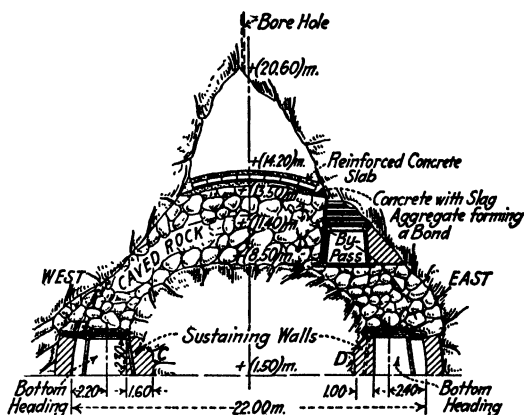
CROSS-SECTION OF RING 103, DURING CONSTRUCTION OF THE REINFORCED CONCRETE SLAB.
